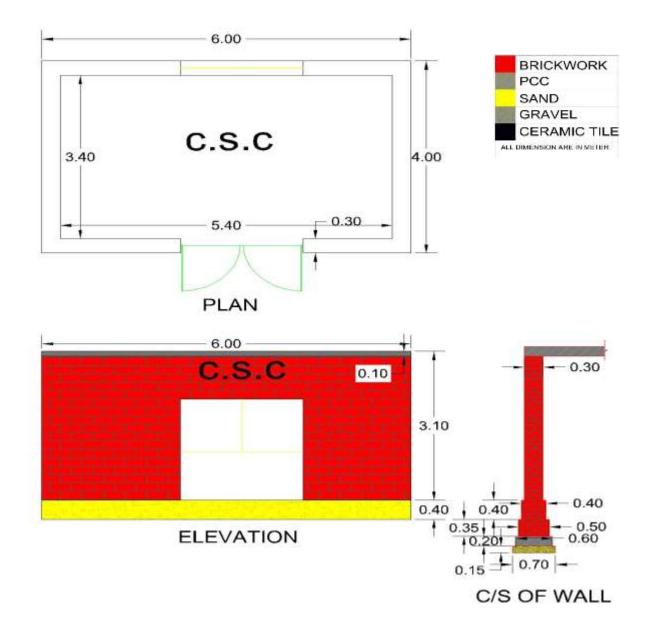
Plan, Elevation & Cross Section of Common Service Centre
